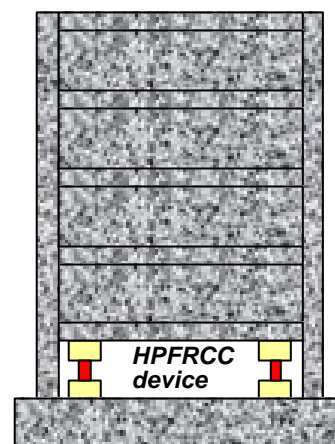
HPFRCC devices for structural control of RC buildings with soft-first story
